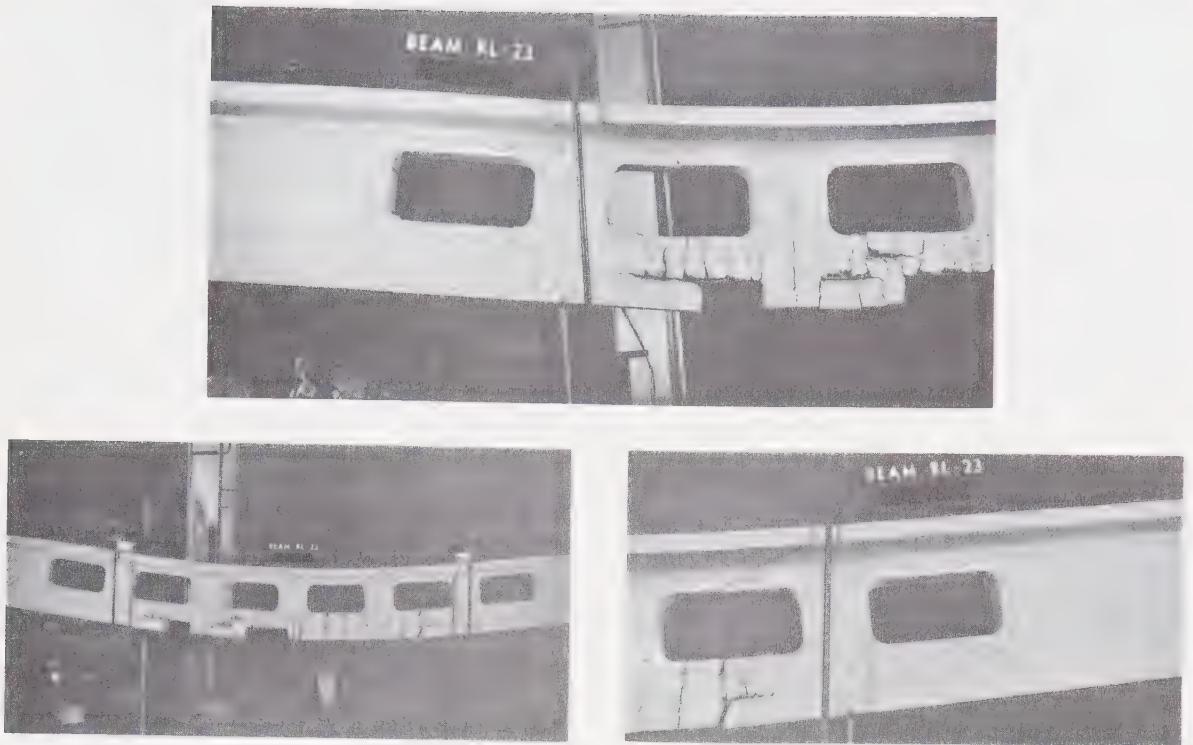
CRACKING AND FAILURE PATTERN OF BEAM 23-16-4
